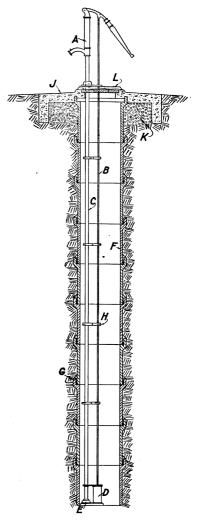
Dug well curbed with vitrified socket pipe. A, Pump stand; B, pump rod; C, riser pipe; D, cylinder; E, check valve; F, vitrified socket pipe; G, ioints packed with a strand of oakum dipped in grout and filled with cement mortar; H, pump rod guides; J, platform; K, gravel foundation; L, cross-planked cover.
